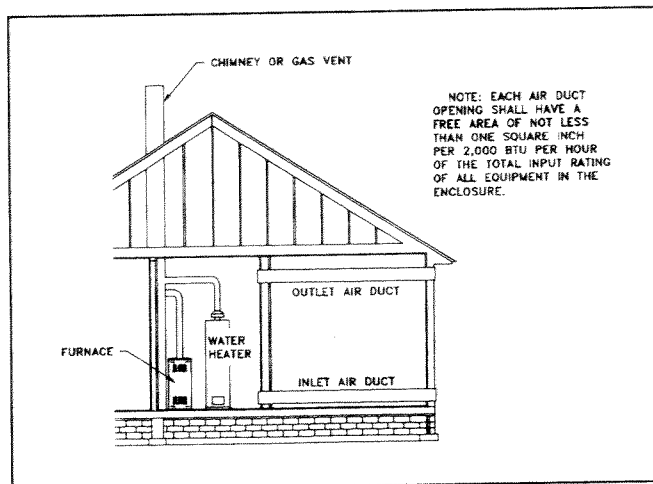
All Air From The Outdoors Through Horizontal Ducts.
